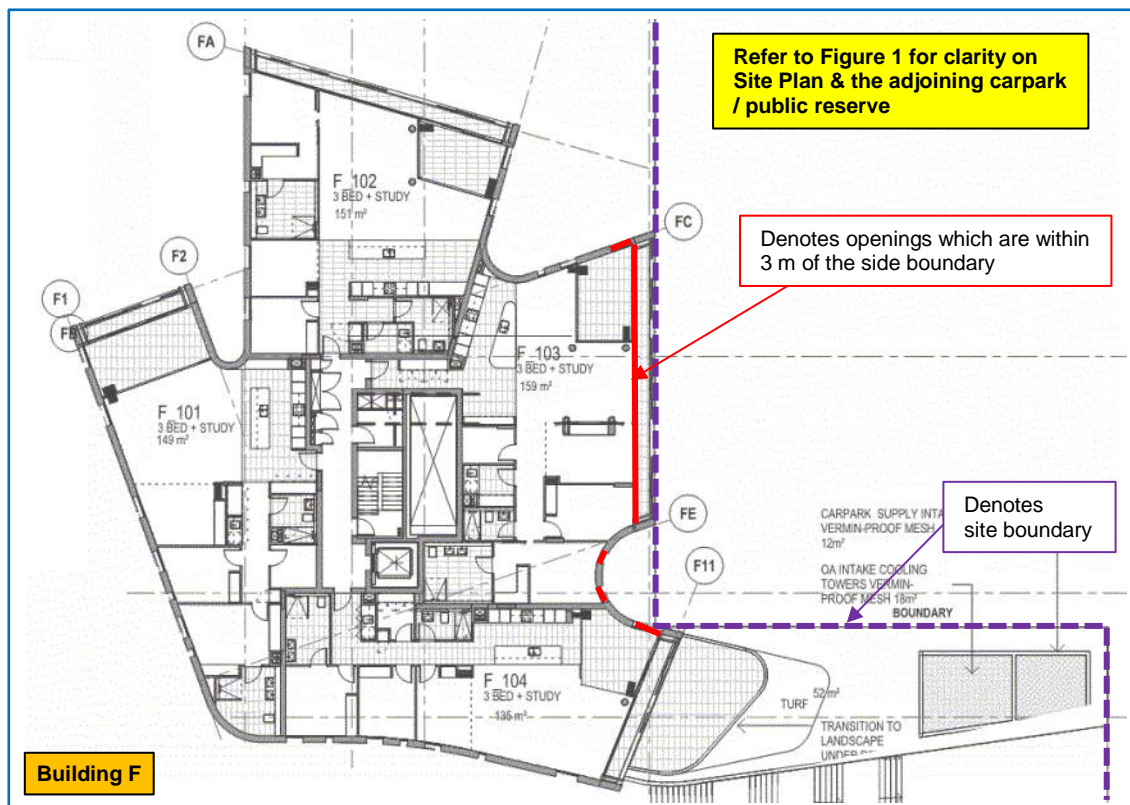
Building F (Level 1) – unprotected openings within 3 m of the side boundary
